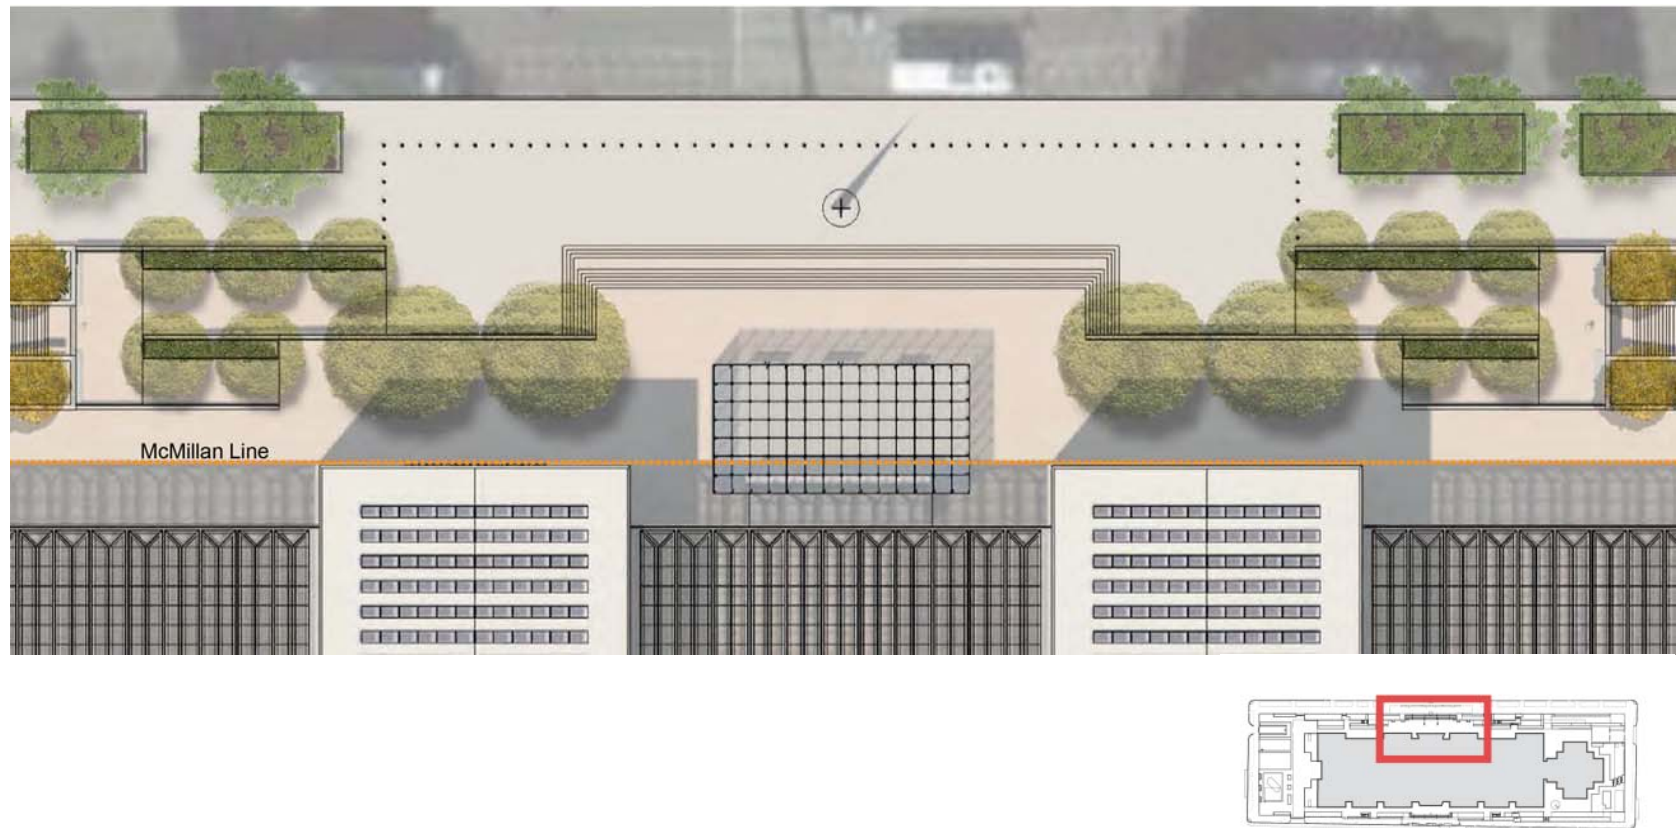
18: North Vestibule Design 'B' Plan. (Source: QEA.)
